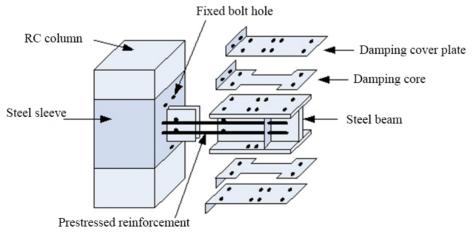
The basic disassembled structure of a self-centering RC column-steel beam joint
